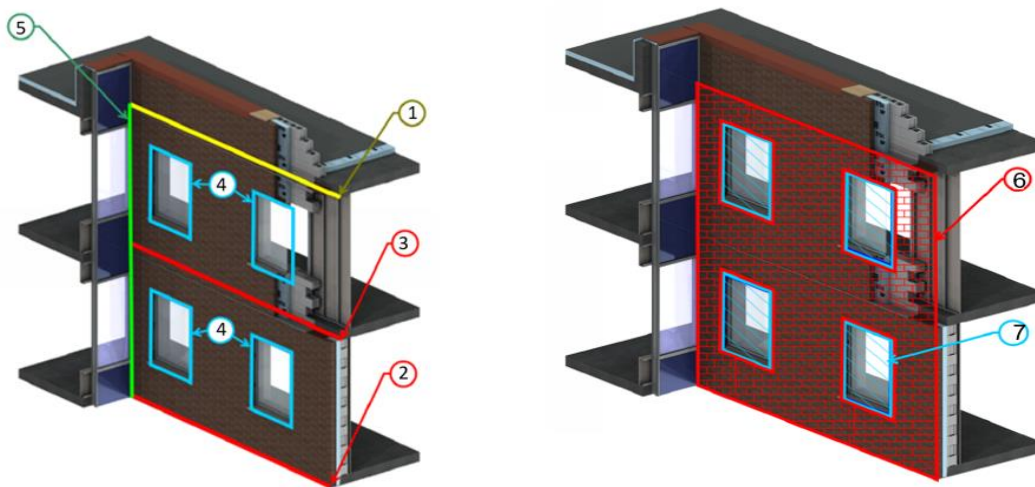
Example of building length and area takeoffs: (1) Parapet length; (2) Slab lengths; (3) Intermediate floor; (4) Wall to window transition lengths; (5) Corner length; (6) Opaque wall area, and; (7) Glazing area [21]
